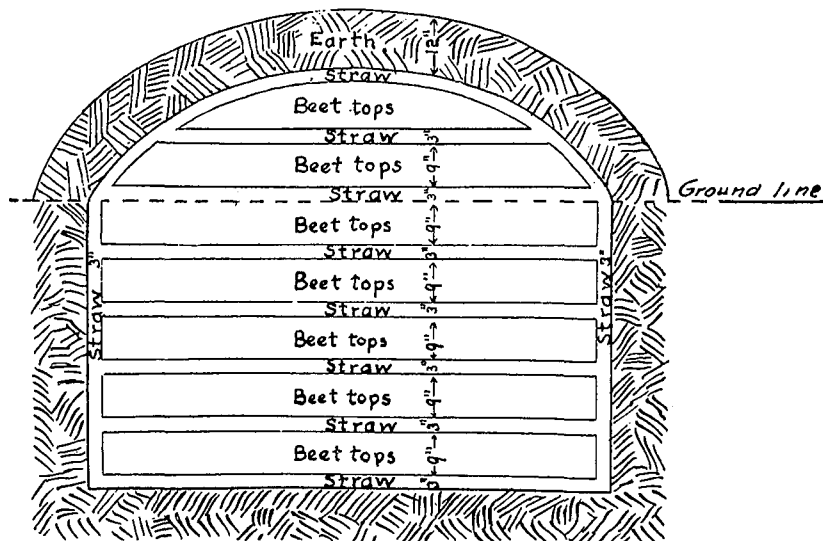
(From U. S. Dept. Agr. Farmers Bulletin 1095.) Sectional View of a Trench Silo with Earth Walls
